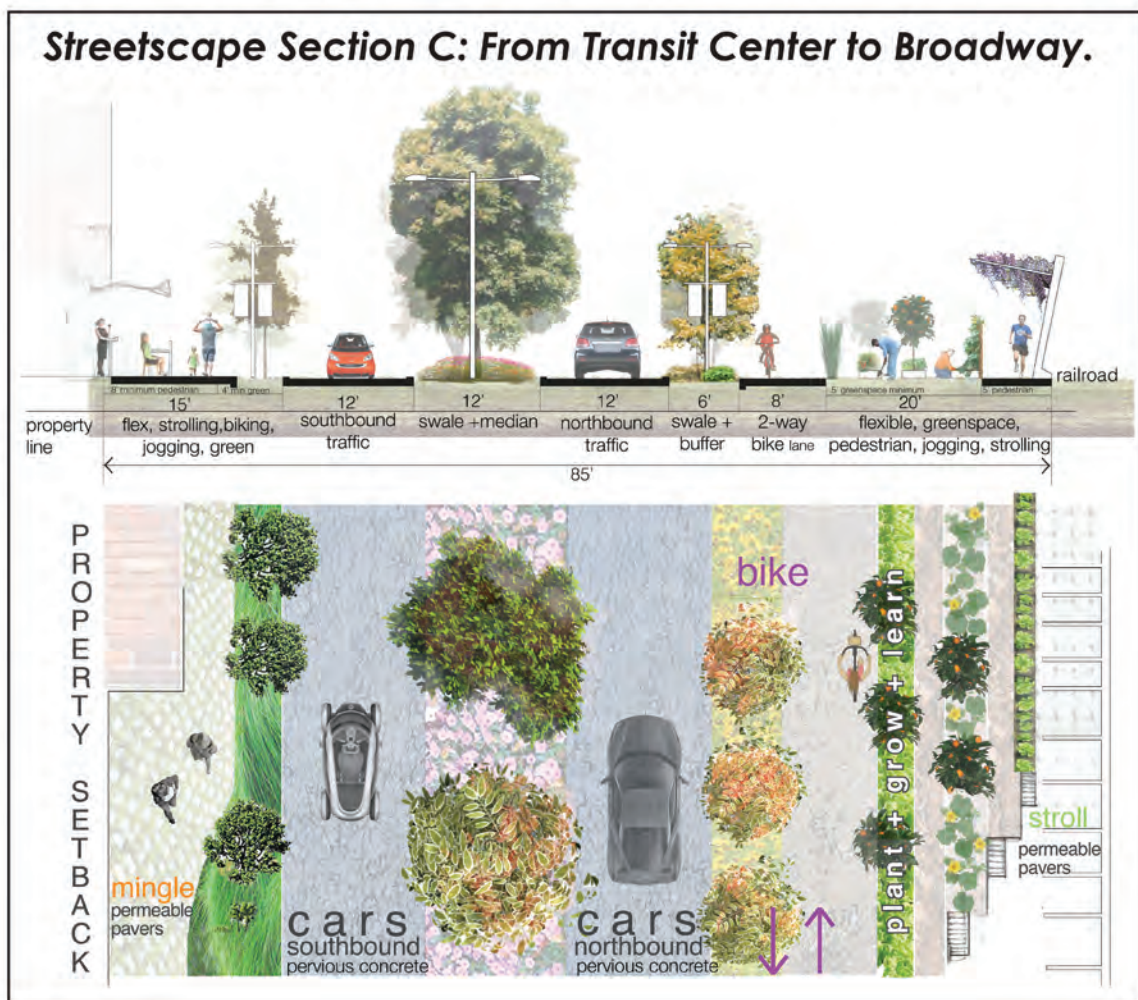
Streetscape Section C: More urbane streetscaping nearer to Broadway Street and First Street intersection
